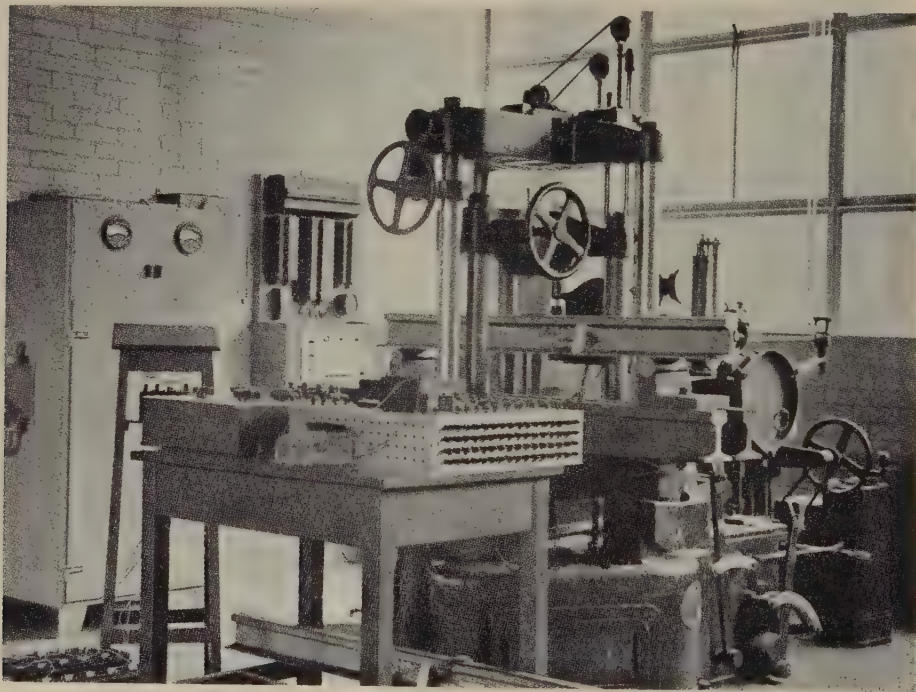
Testing 80 R.B.S. rail in a Buckton machine.
